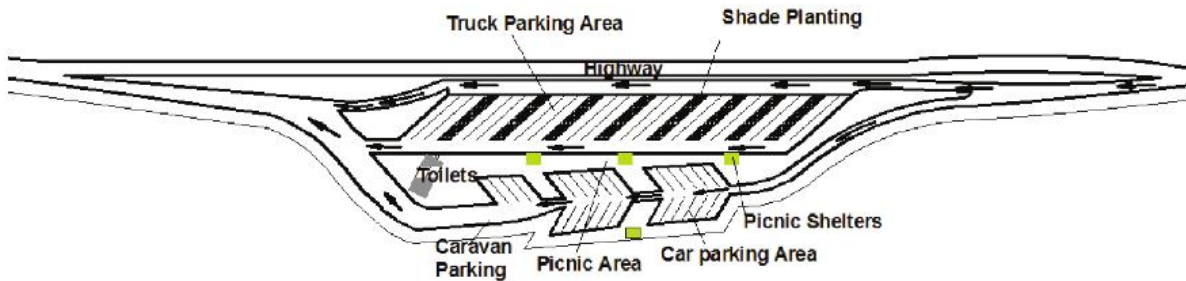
Typical layout design with truck and car parking of minor rest areas –angle parking design (Source: Tanzania Draft Design Manual, 2010)
